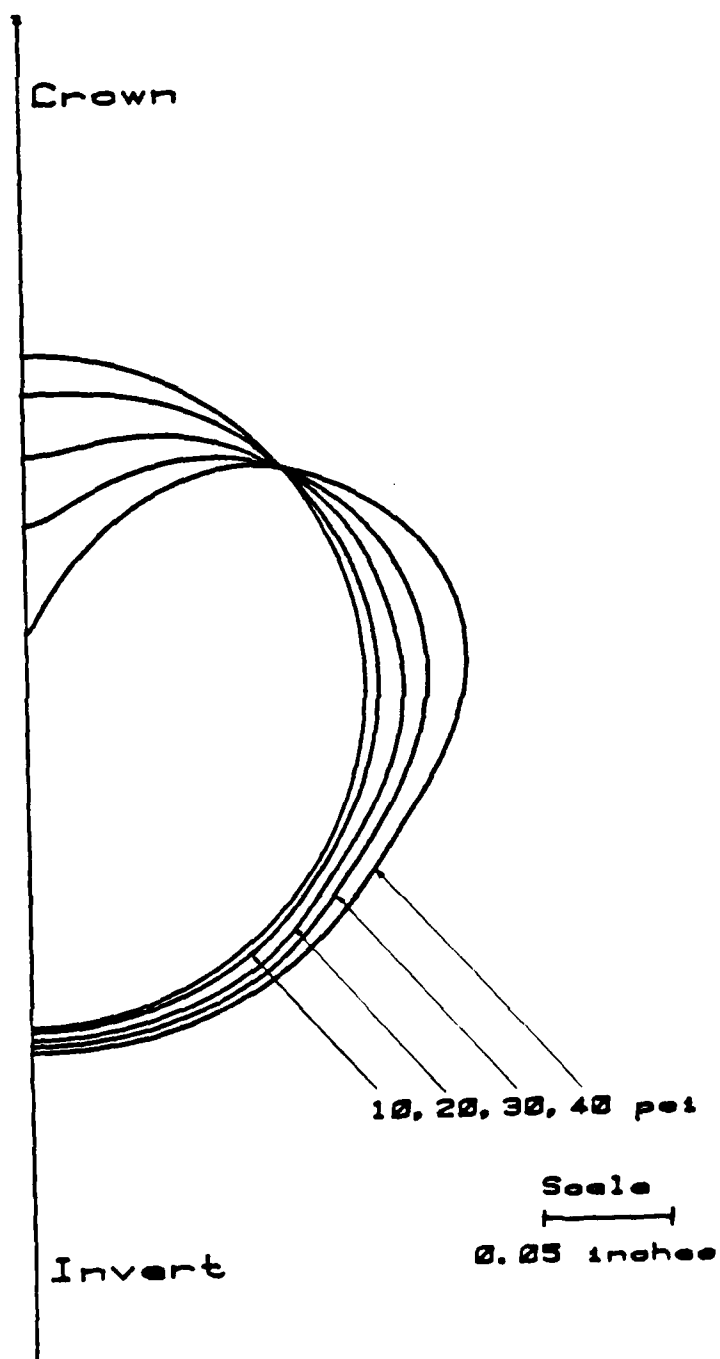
Deflected Culvert Under Symmetrical Loading
